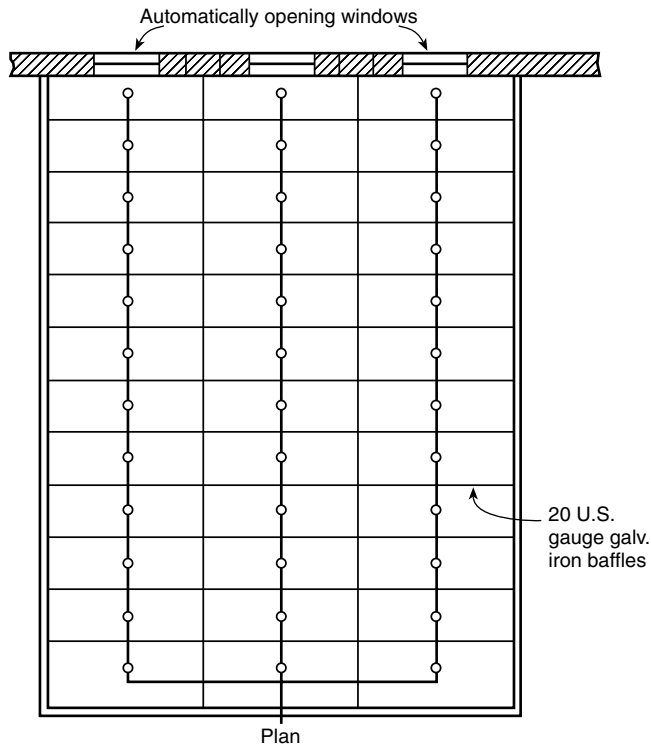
Tote box storeroom showing general arrangement of racks and sprinklers.
